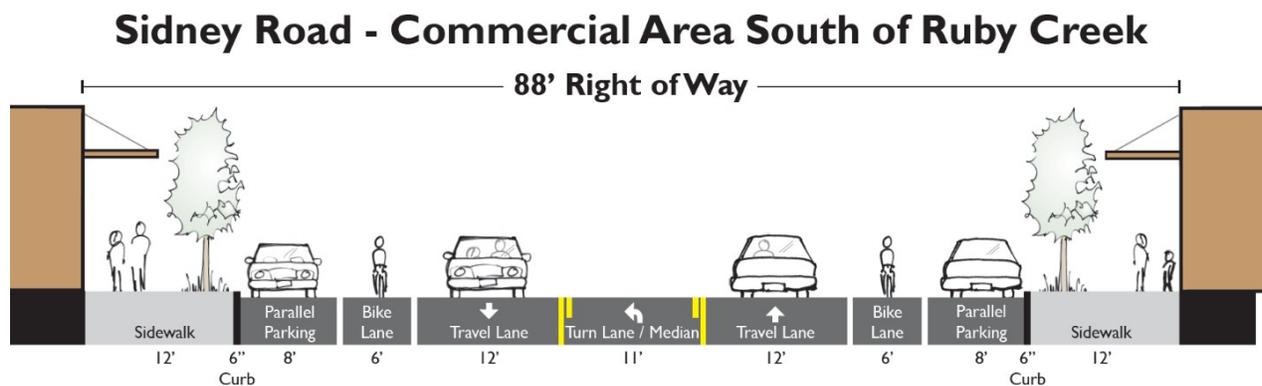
Sidney Road SW – Storefront Road Section. This road section corresponds with the section of Sidney Road SW designated as a storefront street in Figure 13.
